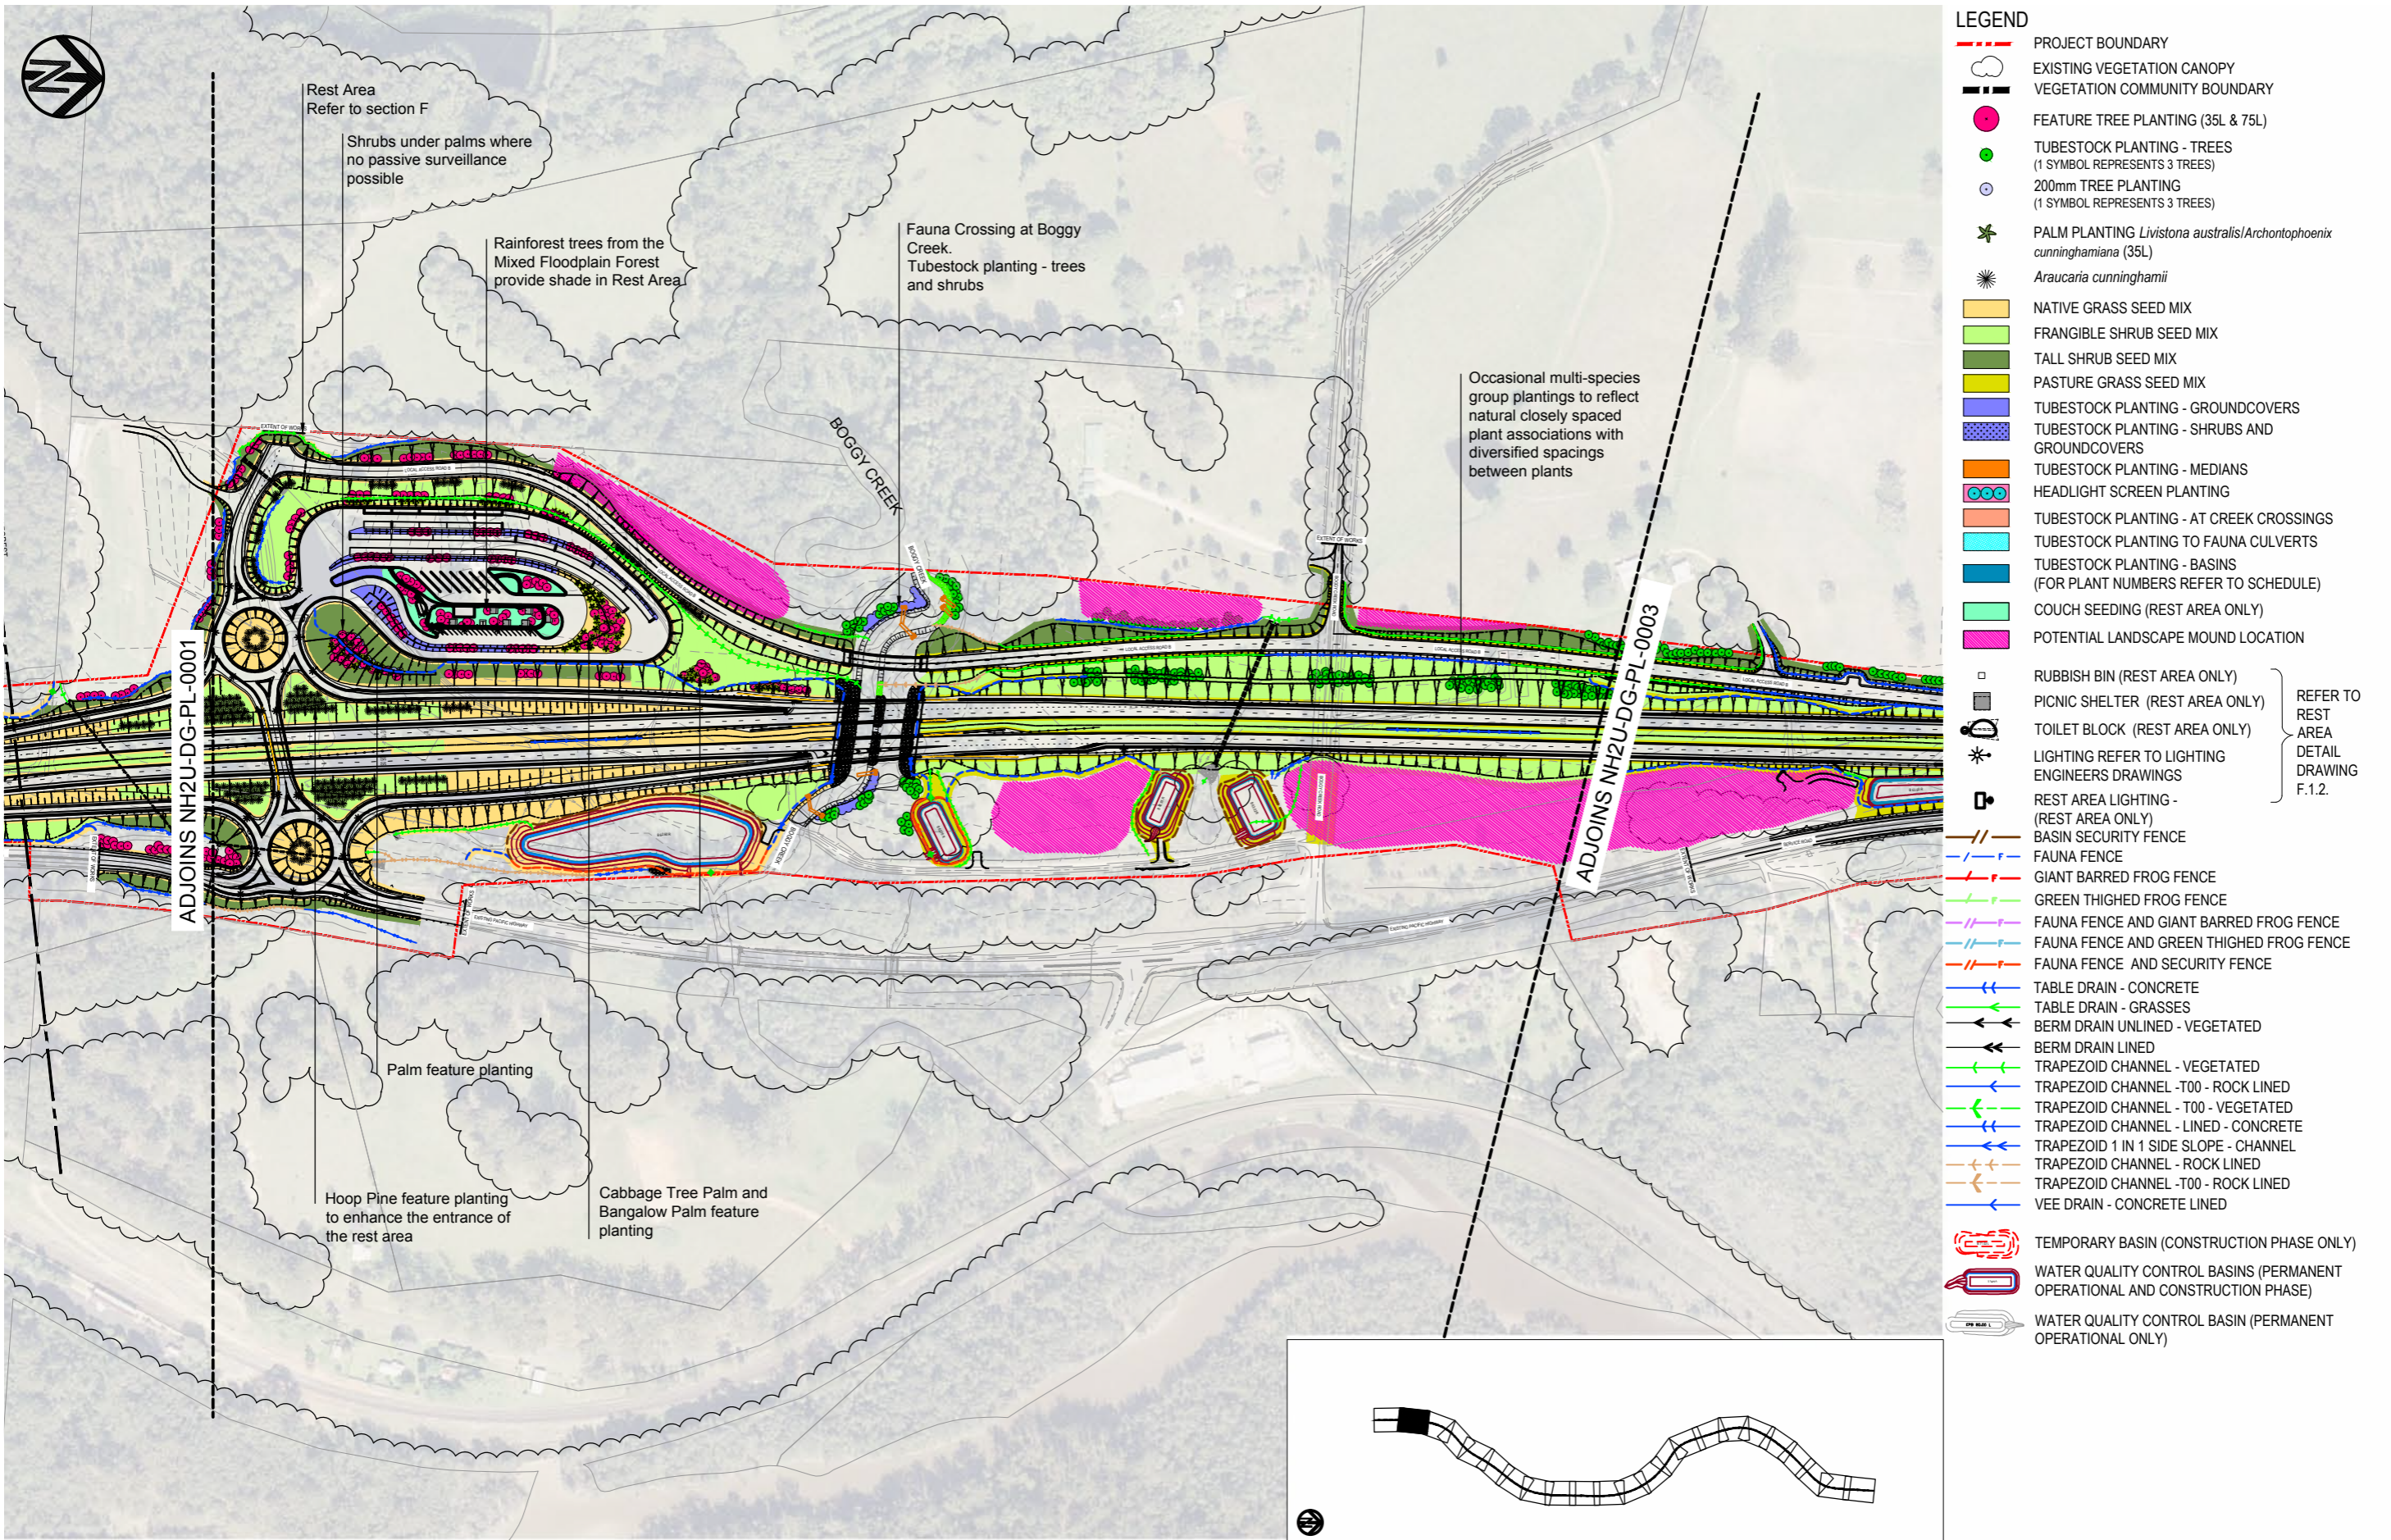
Planting Plan 2: NH2U-DG-PL-0002
